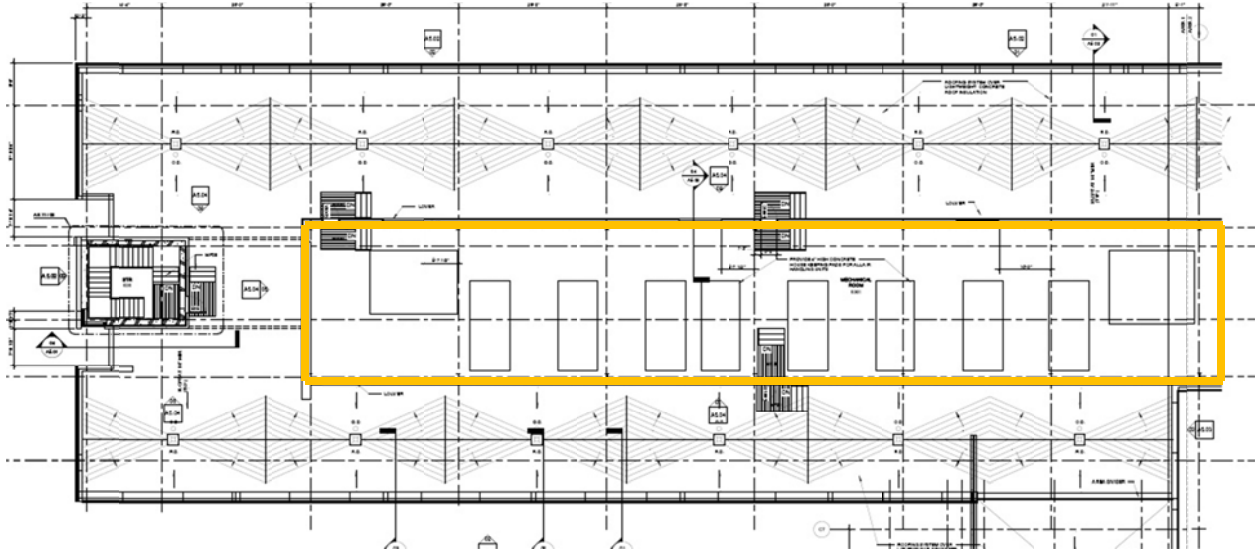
A-261 Sixth Floor Roof, Main NICU Tower – from 100% CD's, Compliments of HKS, Inc.
